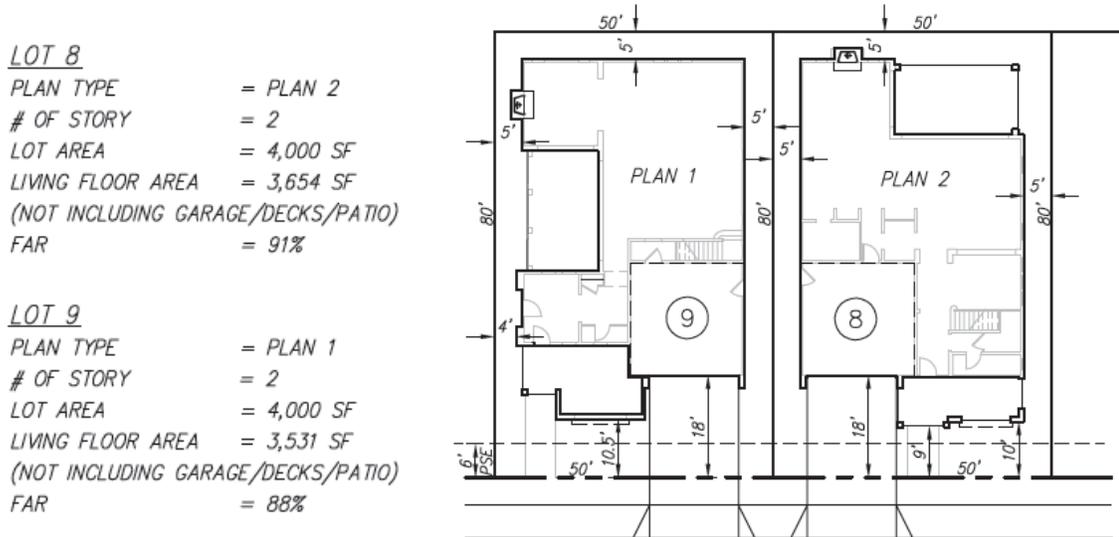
Typical Lot Plan²⁶ for the Two-Story Single-Family Homes.
